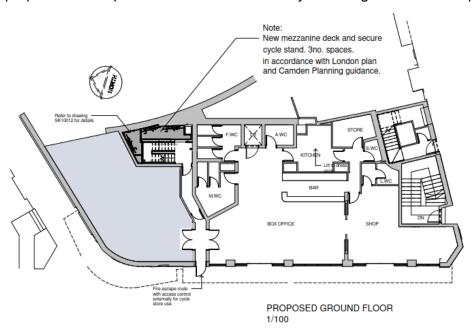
Approved Theatre Ground Floor Plan and proposed new cycle storage location
